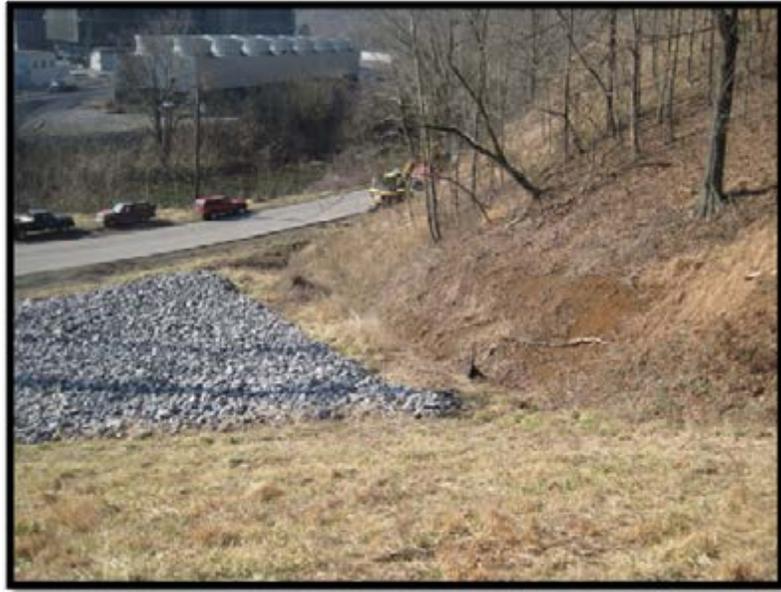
South abutment ditch. Note downstream slope rip-rap used for seepage control and abutment ditch used to convey hillside drainage.
